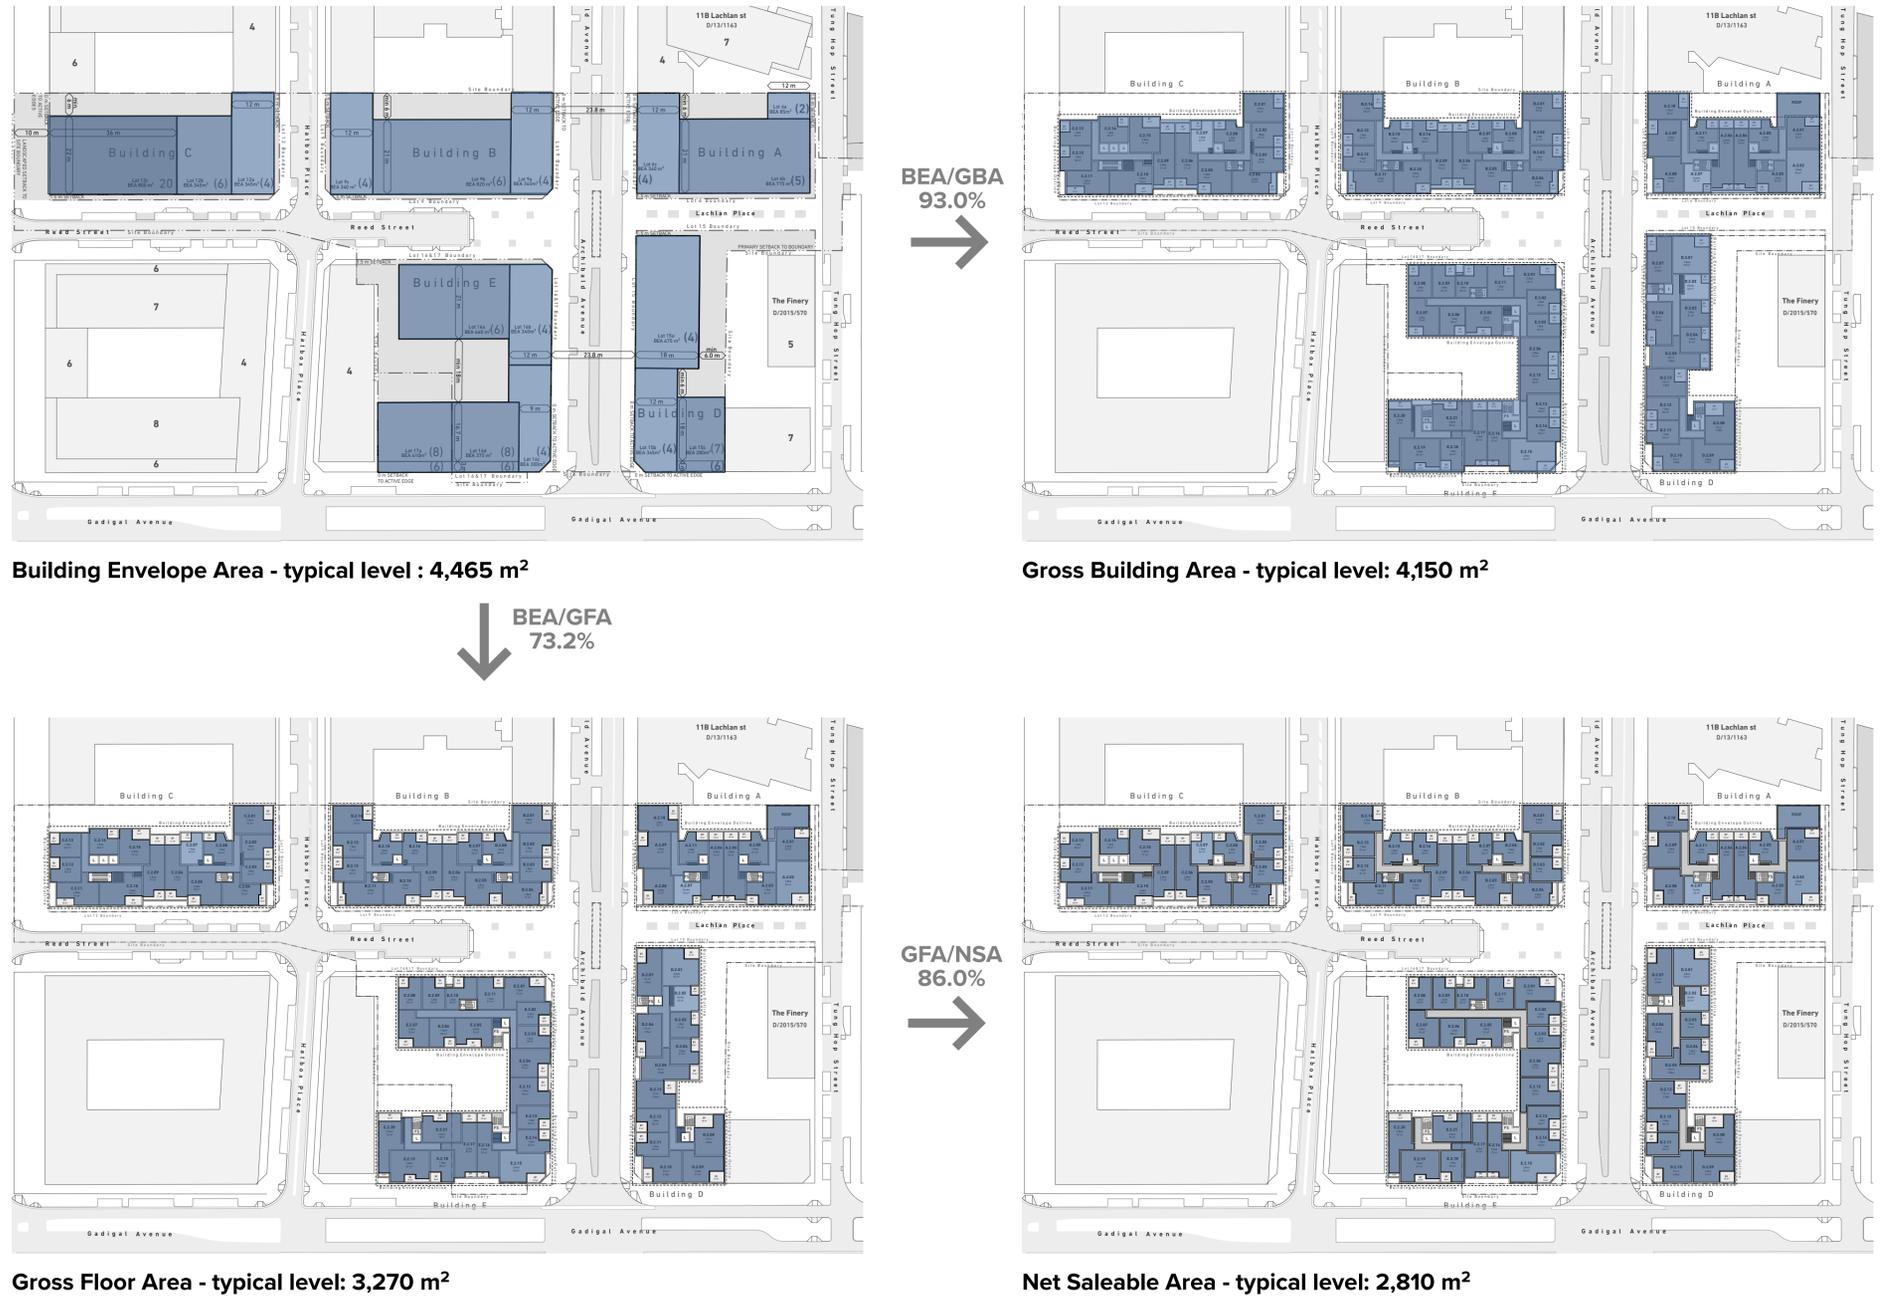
O'Dea Masterplan Building Area Summary
